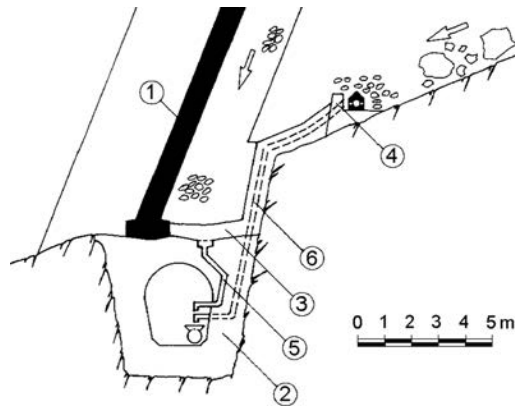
Joint of the asphaltic concrete core with the control gallery, Finstertal dam (ANCOLD, 1991). (1) Control gallery; (2) asphaltic concrete core; (3) concrete overflowing wall; (4) concrete directing wall with a drain; (5) drain pipe for water filtrated through certain section of the asphaltic concrete core; (6) outlet of infiltrated atmospheric water and water penetrated through rock foundation.
